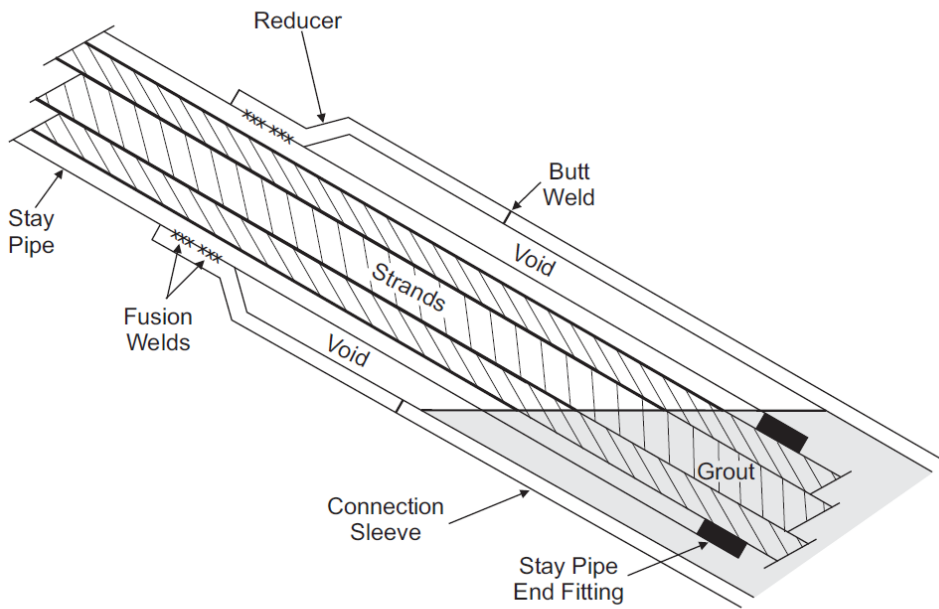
Sectional View of Grout Void Disposition in Deck Anchorage Connection Sleeves.
